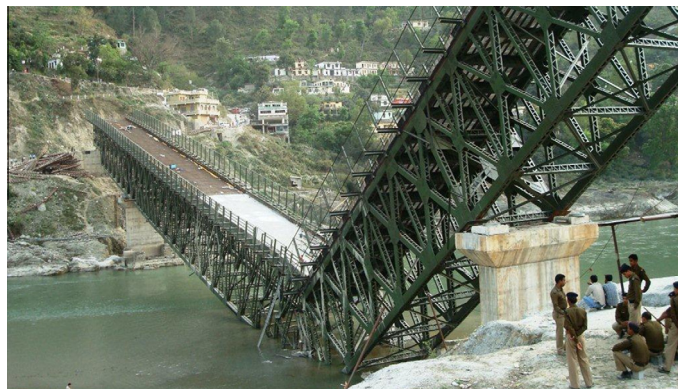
Failure of Chauras bridge during casting of deck slab.
